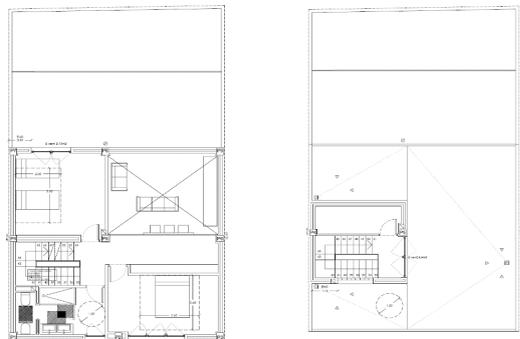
Plans of the house part 2: Third and fourth floor section. Source: Own source
